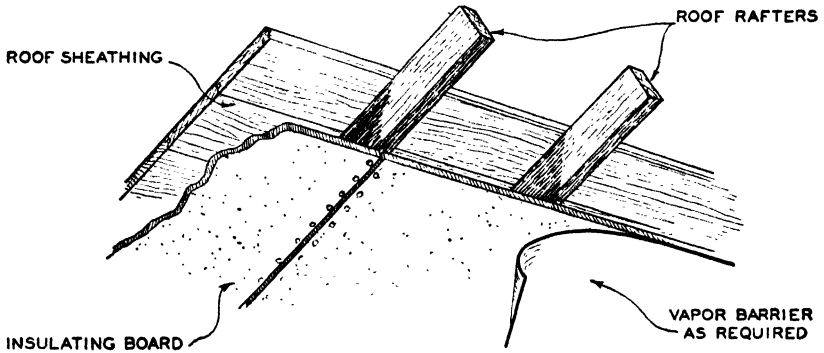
Insulating Board Applied as a Lining to Under Side of Roof Rafters
